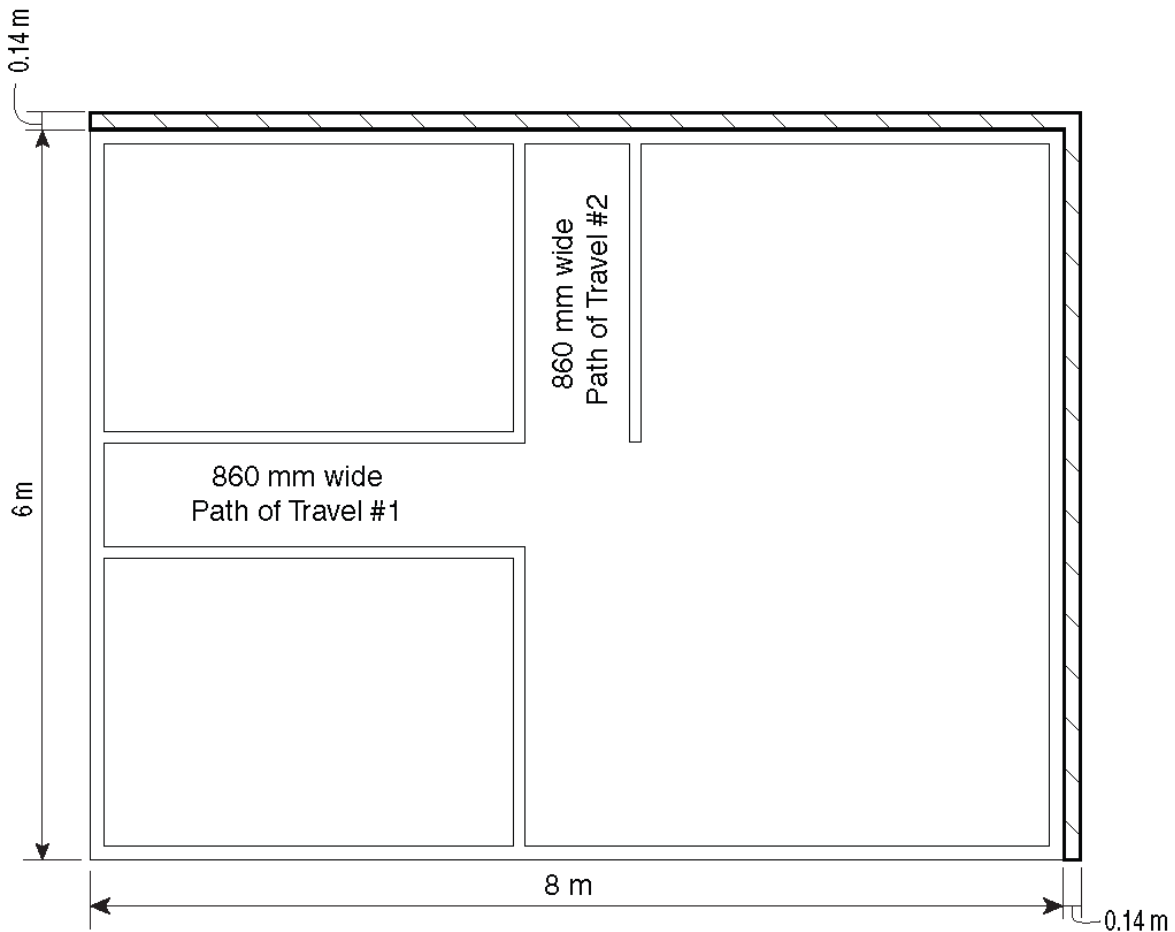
Example applying the proposed change in minimum width of path of travel in a dwelling unit
